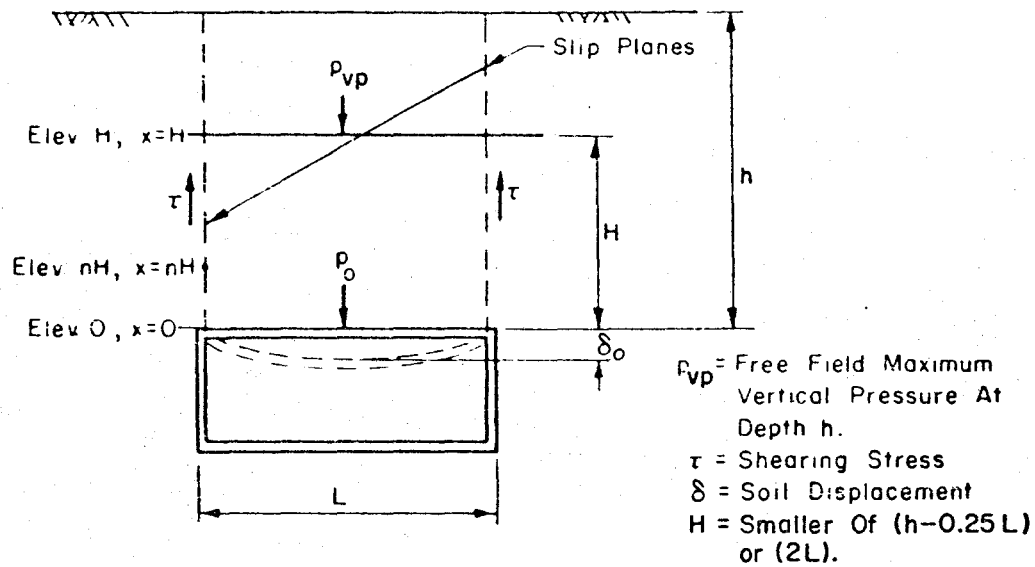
CROSS-SECTION OF UNDERGROUND STRUCTURE
